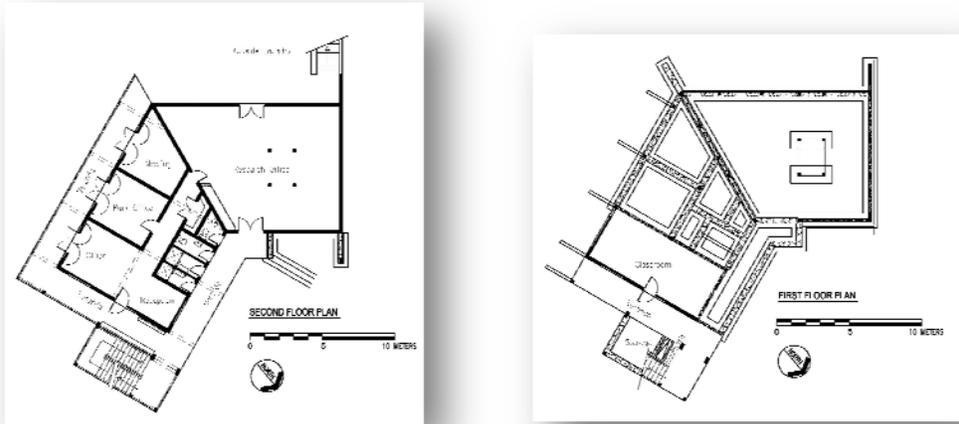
Madagascar: second and first floor plans of Centre ValBio. Source: Fieldwork.
